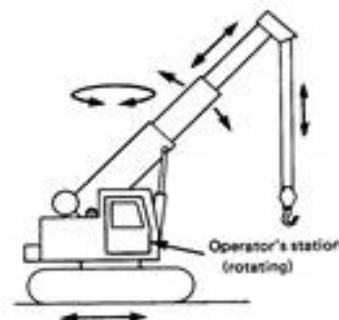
CRAWLER CRANE — TELESCOPING BOOM
